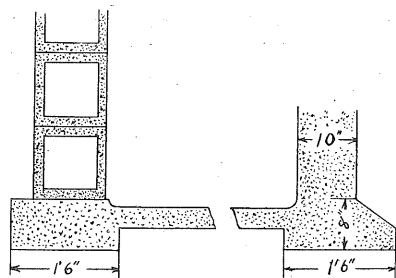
TYPICAL FOOTINGS FOR MASONRY SILOS
